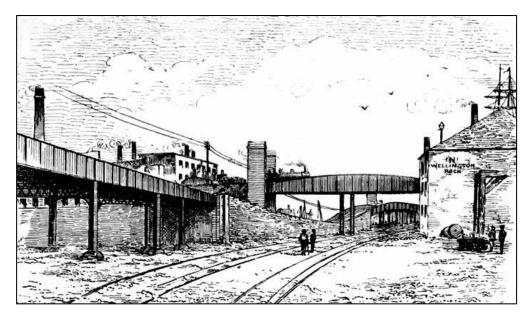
The Liverpool Overhead Railway 'switchback', under the High Level Coal Railway, looking south from Wellington Dock. From The Engineer (1893), reproduced from Parker (nd).
